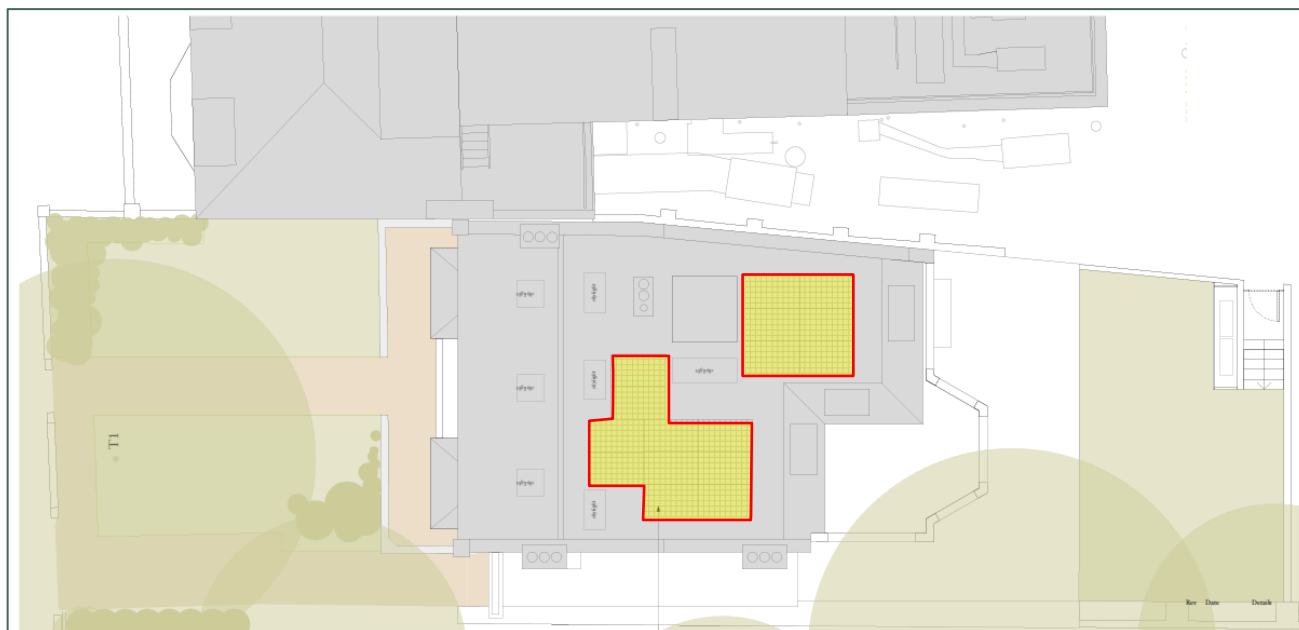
Roof Plan of Proposed Development showing roof space available for PV
